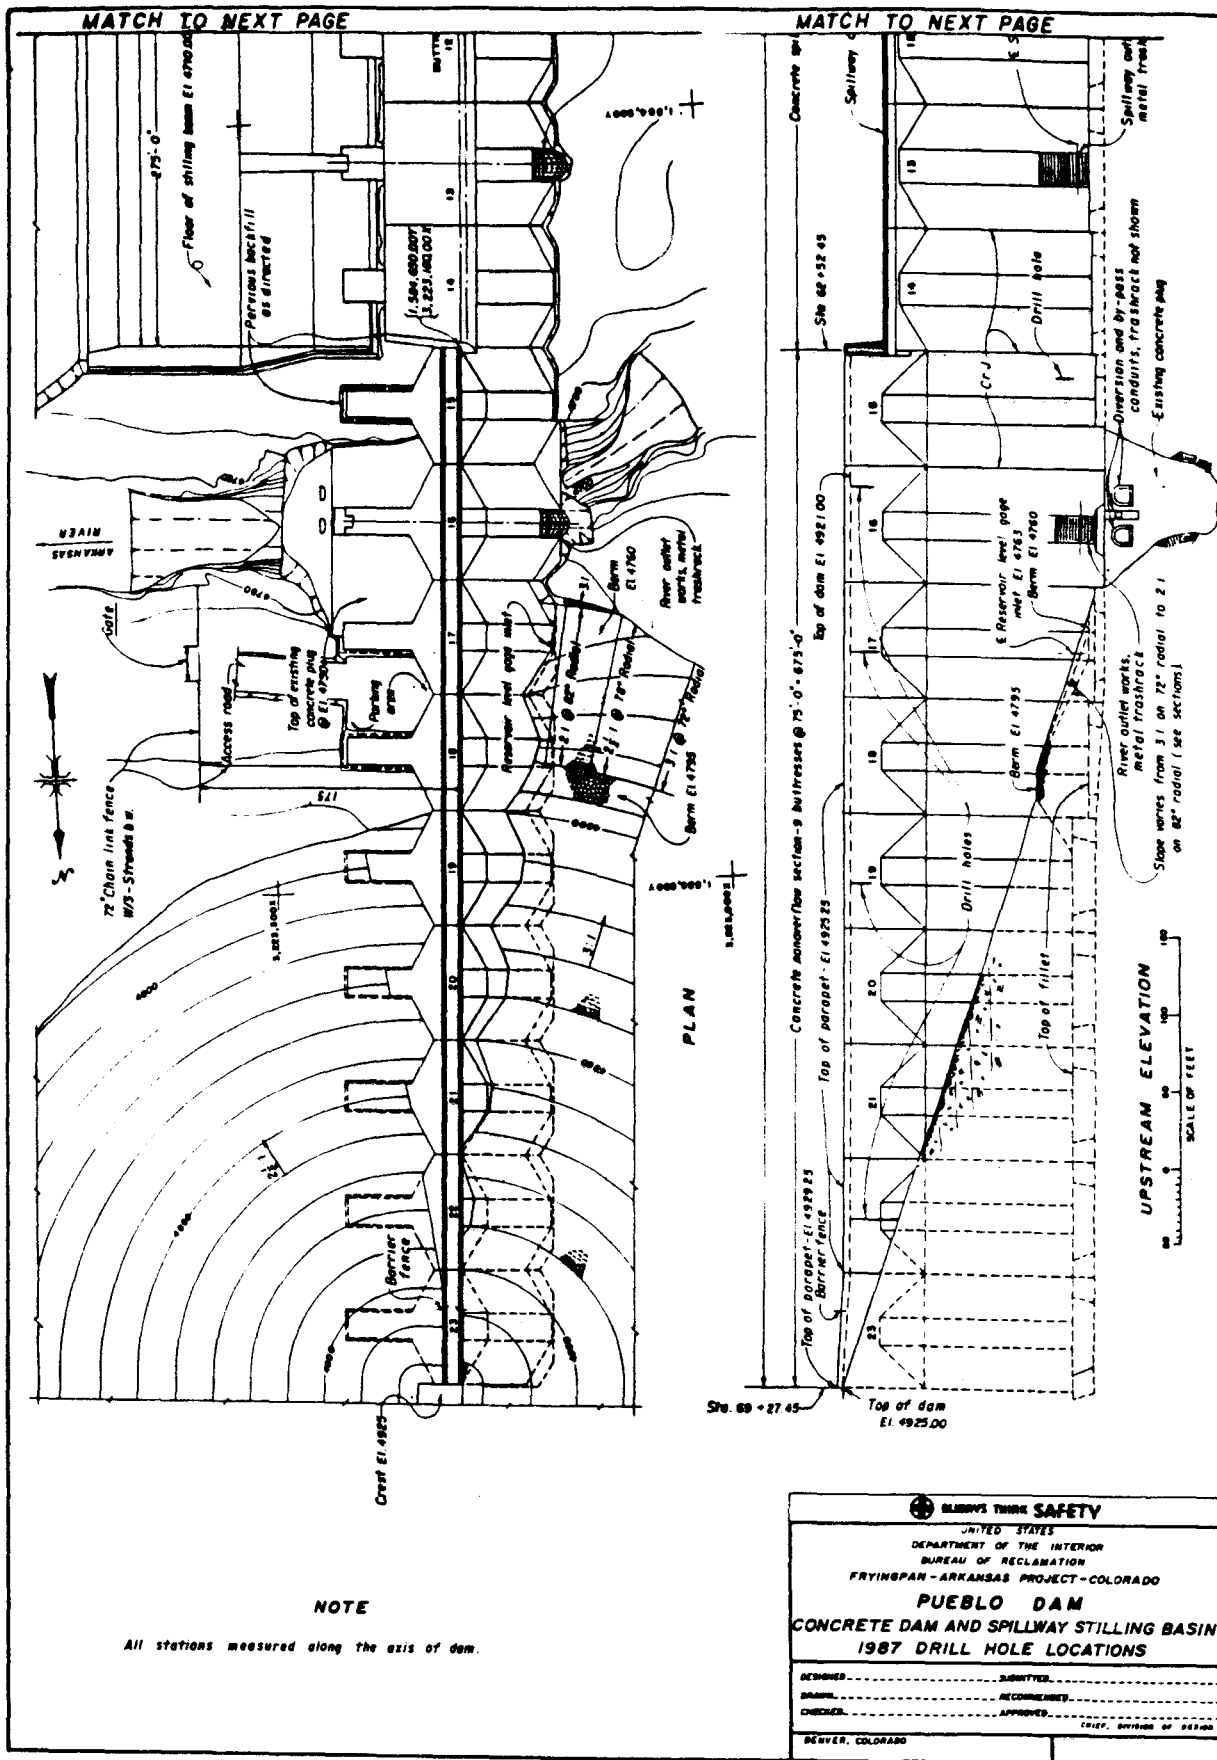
Pueblo Dam - concrete dam spillway stilling basin plan and elevation,
